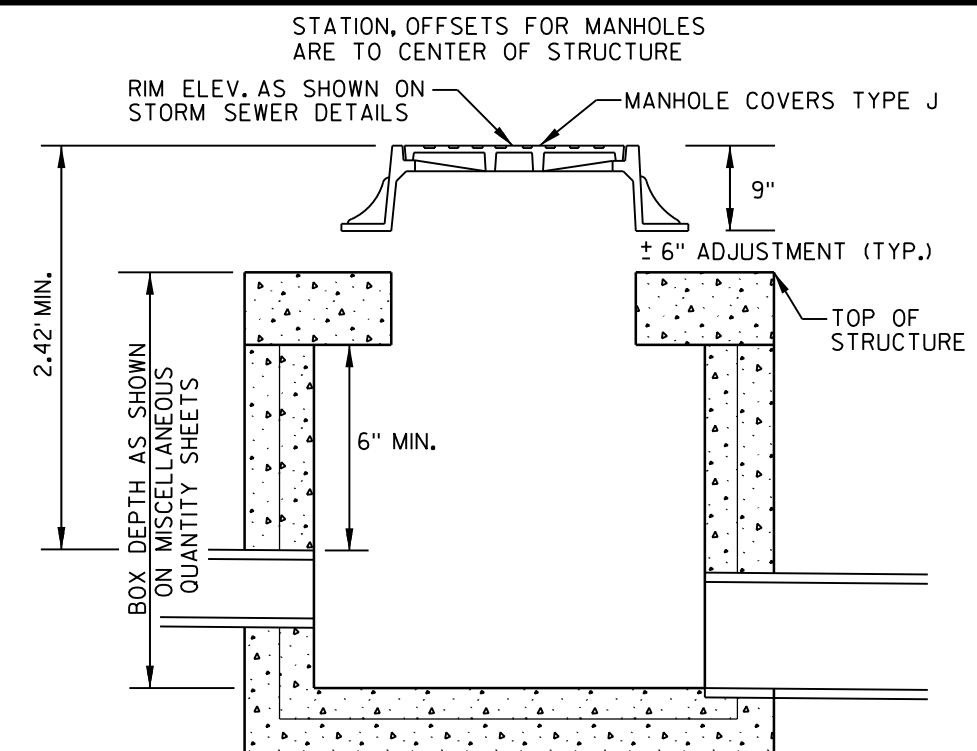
DETAIL FOR COMPUTING INLET ELEVATIONS
